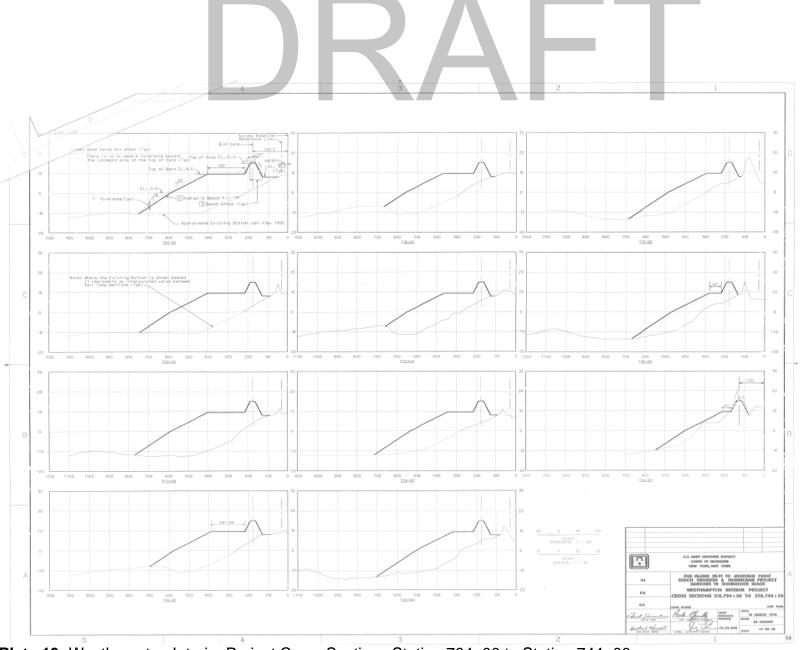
Westhampton Interim Project Cross Sections Station 704+00 to Station 744+00
